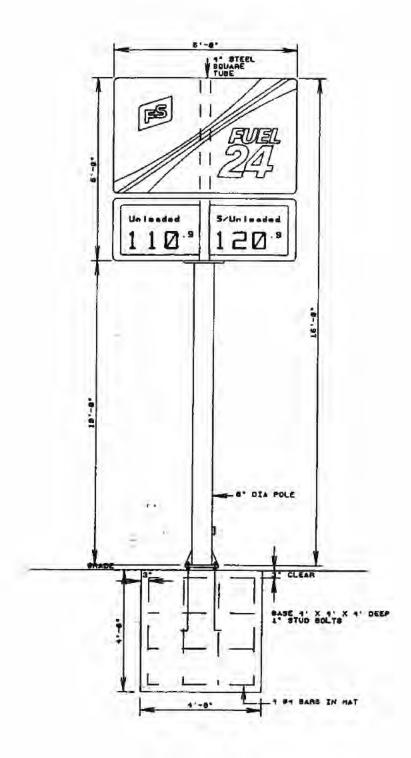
EXHIBIT C: SIGN DIMENSIONS #9808 · Kendall-Grundy F.S. · Sign · Special Use
